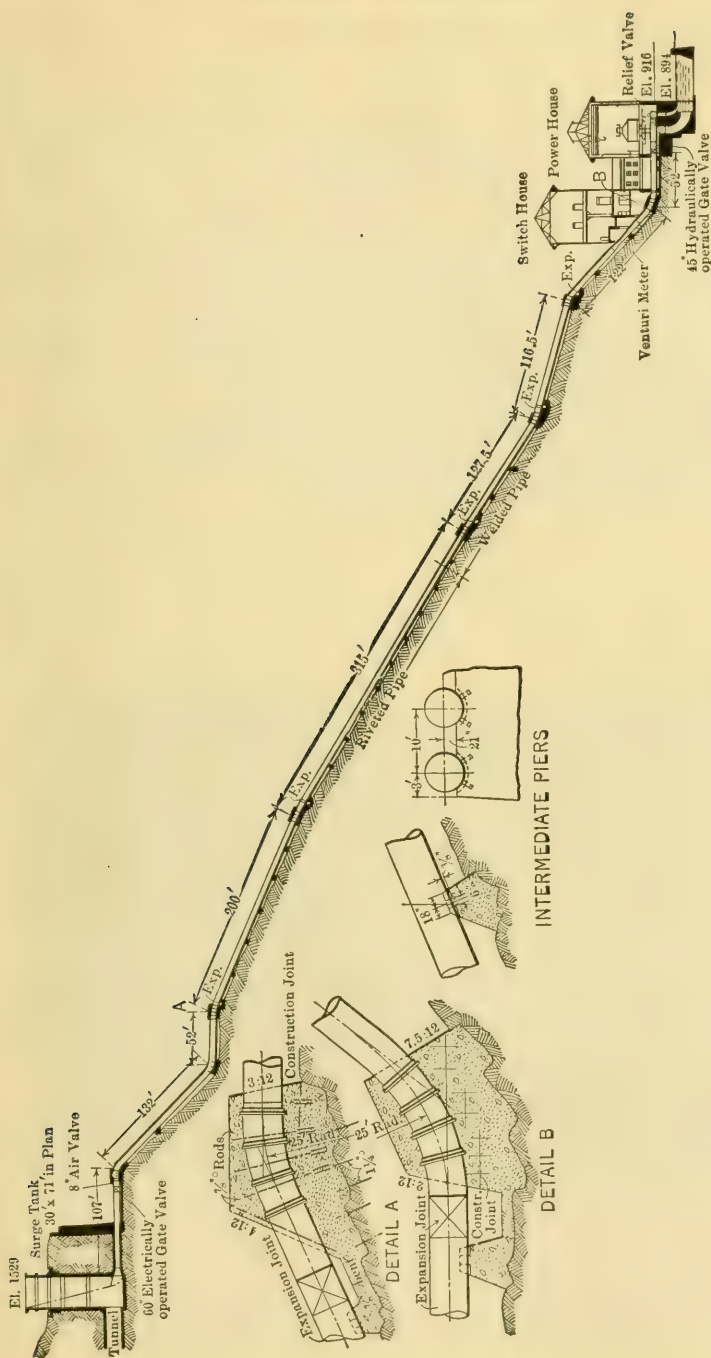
Penstock Showing Location of Expansion Joints and Method of Anchoring.
